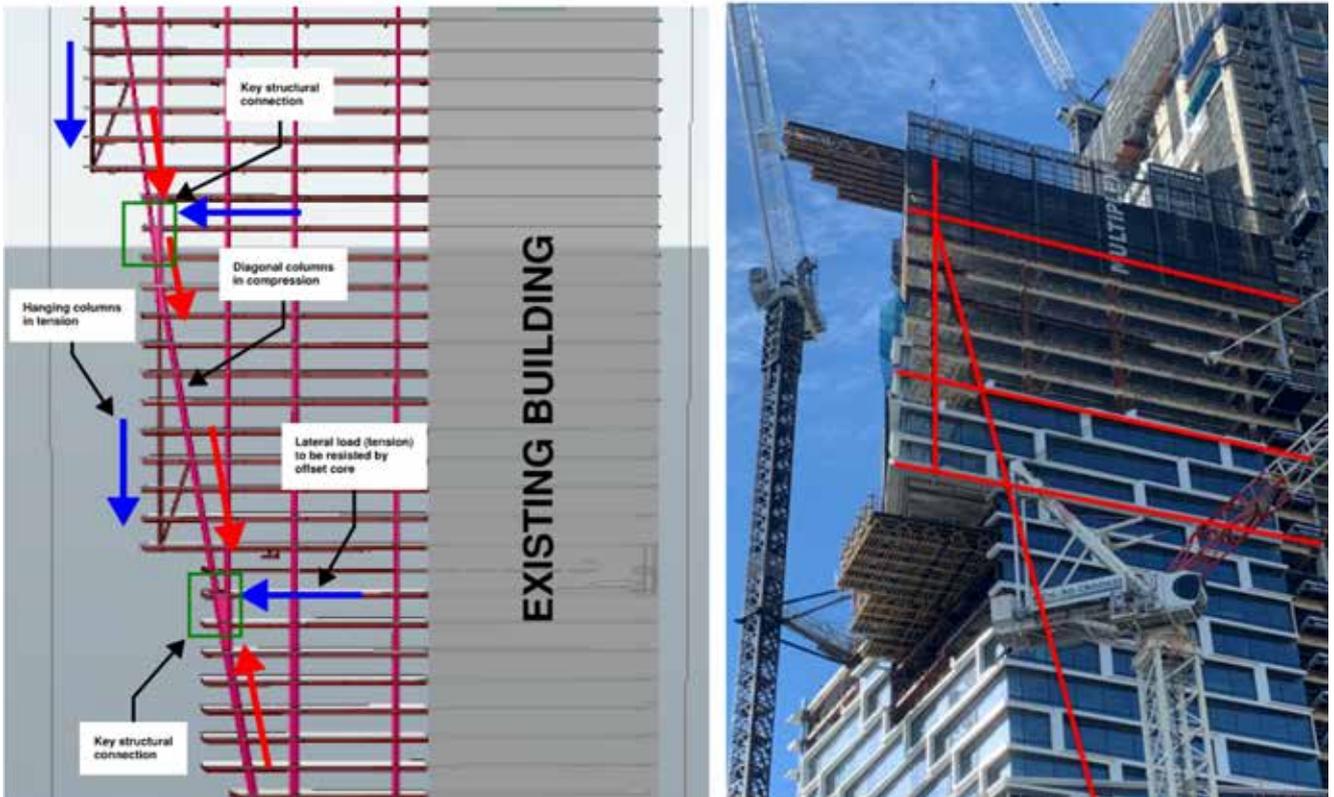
Section of building and load path of Cantilever design shown (left), and photo of hanging and incline column marked up on the project under construction (right)
